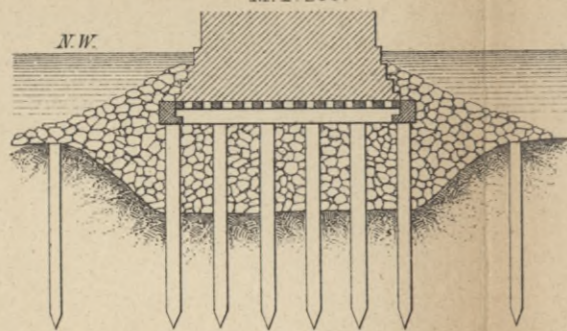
A cross-sectional diagram showing a different method of attaching a sheet pile wall.
